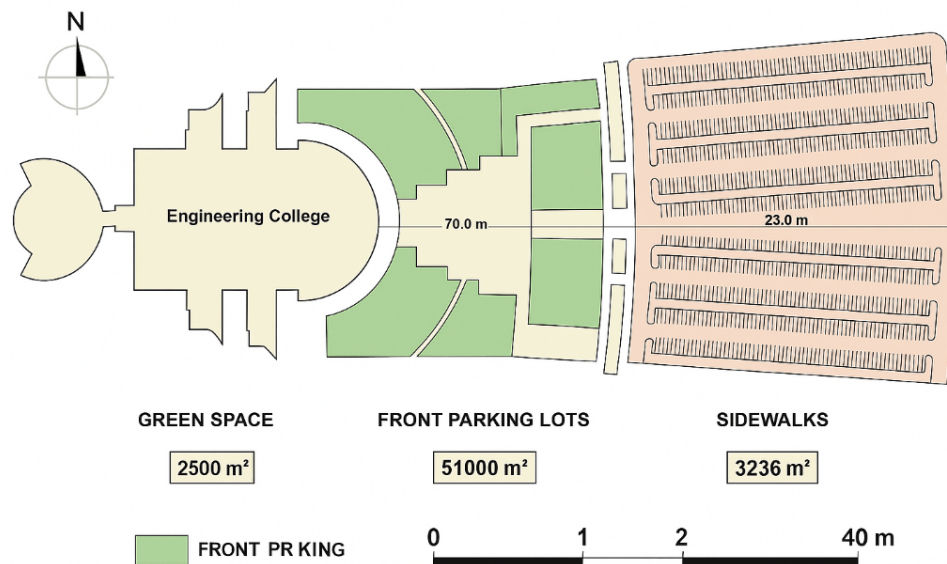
illustrates the site plan of the Engineering College, highlighting the distances from the primary parking zones to the main building entrance. The
